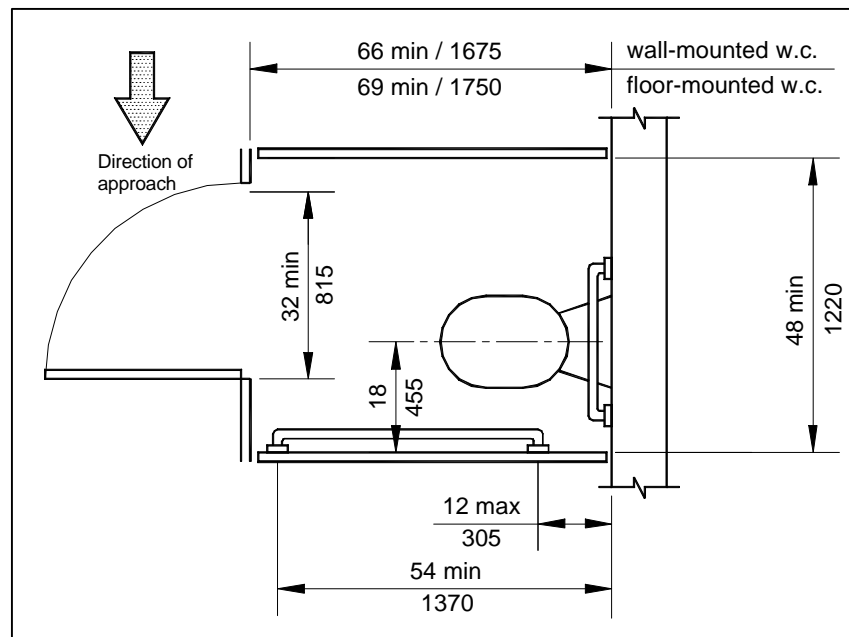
Alternate Wheelchair Accessible Stall (for upgrading only)
